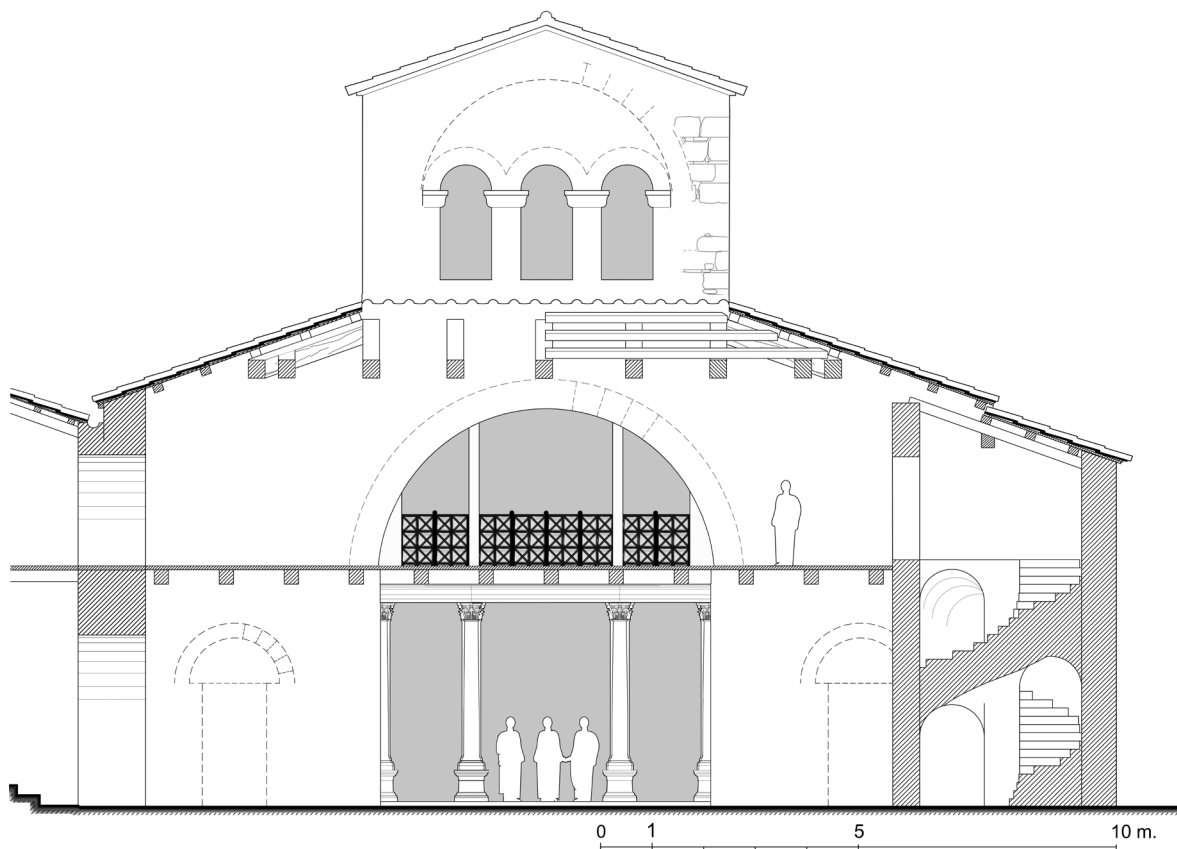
Reconstructed section S–N through the antechamber and the staircase with the elevation of the basilica's east wall in the background. C. Kanellopoulos.
